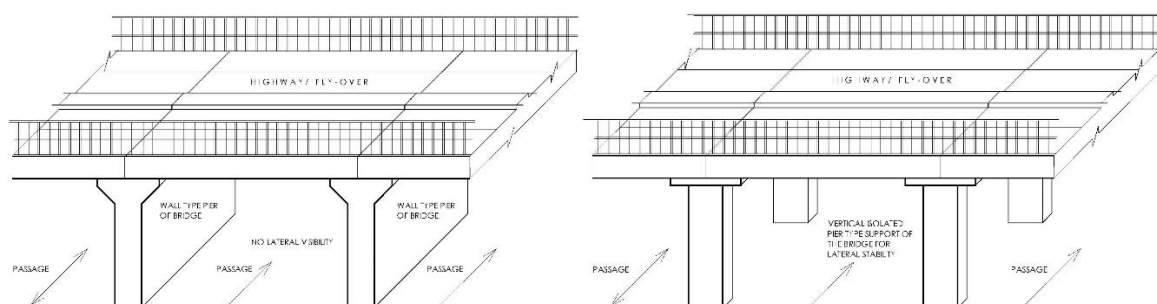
(a) Wall-type division of bridge and (b) pillar-type division
